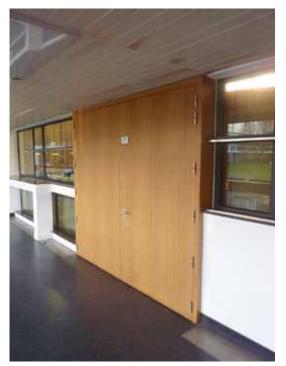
new door to class in hallway E (MH, 06/03/2015).
